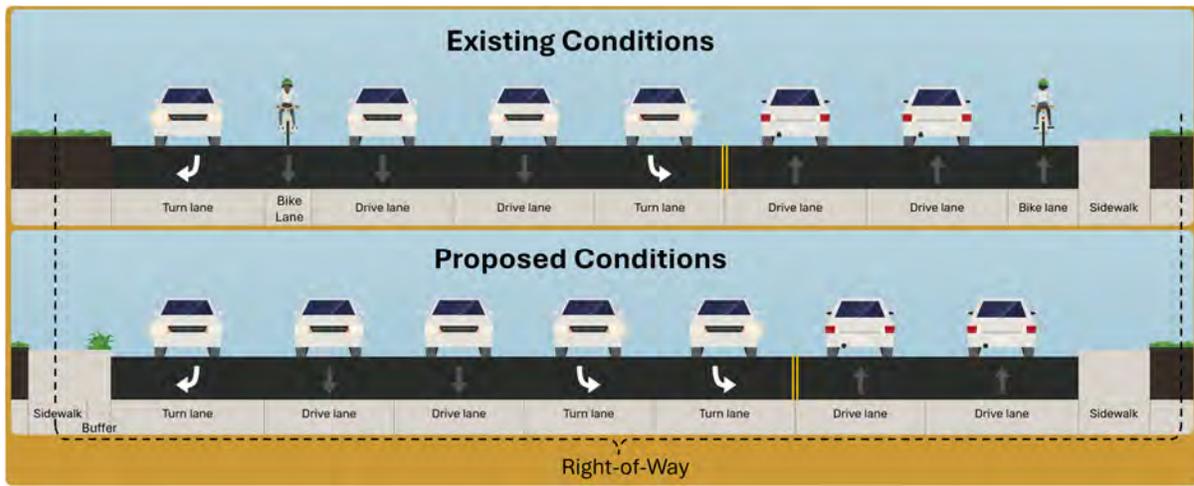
Cross-section looking north on S High Street at intersection with Erickson Avenue
